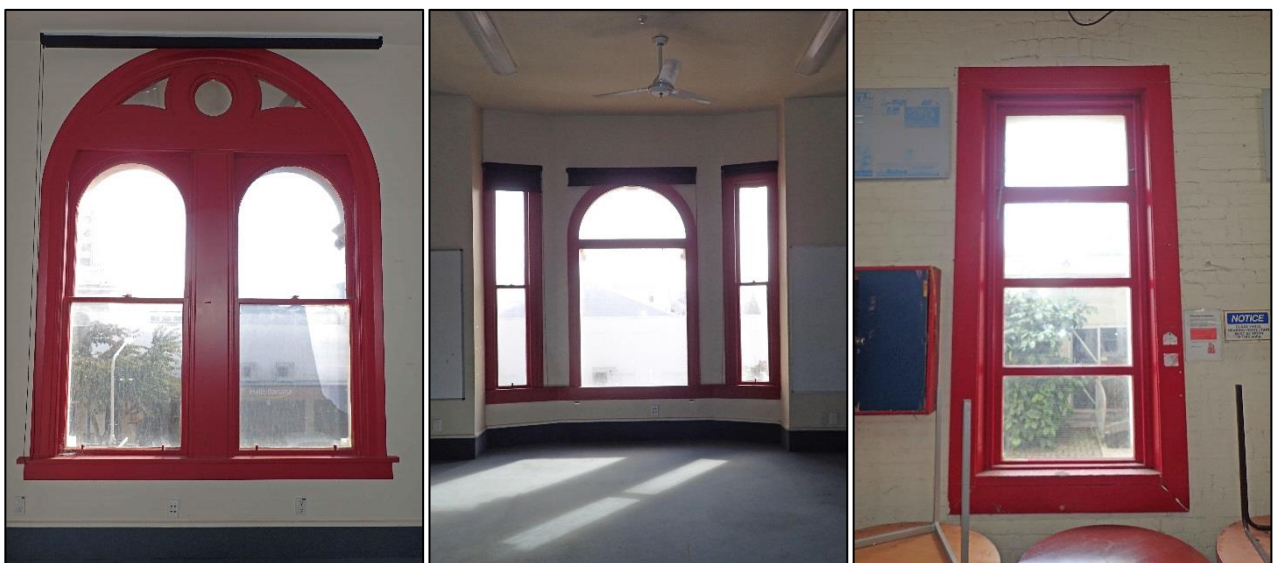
Examples of windows found throughout the Southland Times Building.
